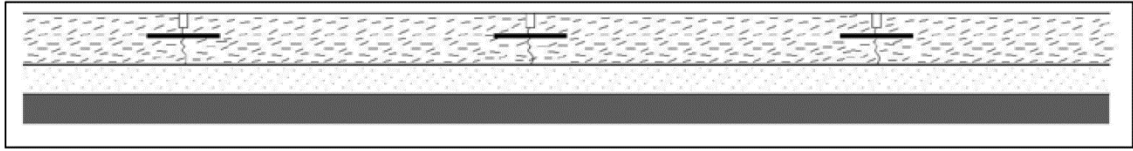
Steel Fibre Reinforced Concrete (SFRC) pavement (Source: SAPEM, 2013d)
